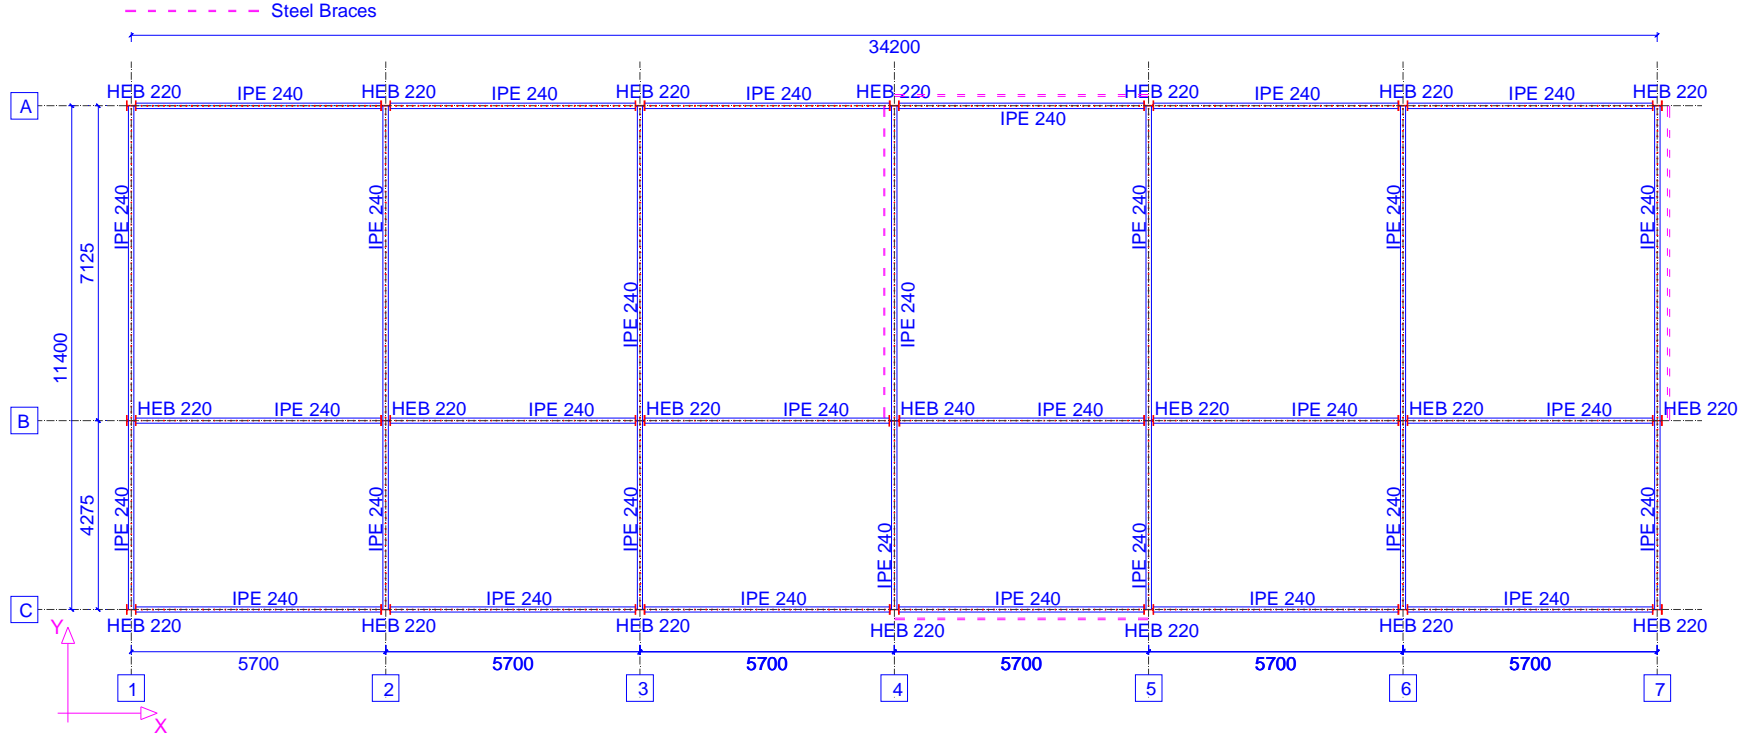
Floor Framing Plan – Asymmetric Configuration (length unit mm)
